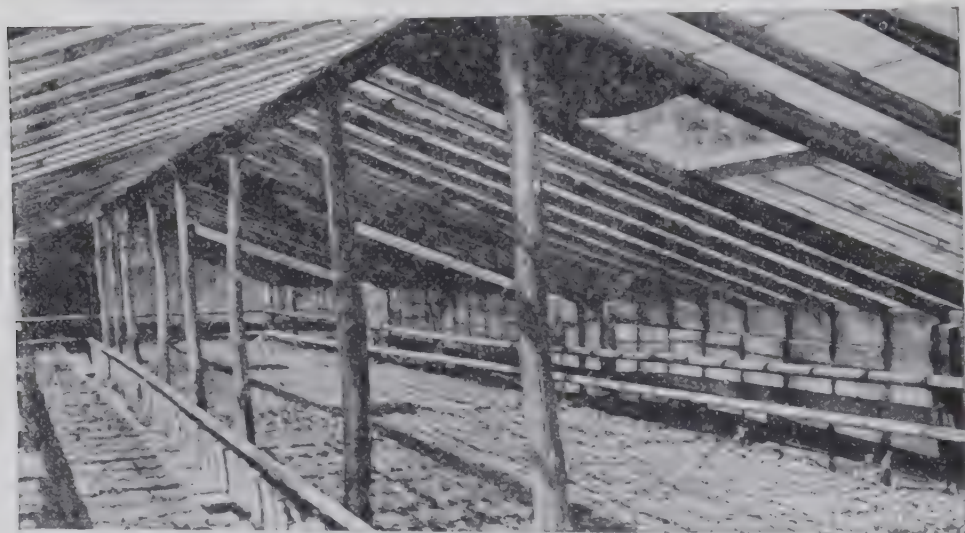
Interior of inexpensively constructed plant house. Excavated walk allows head room.
